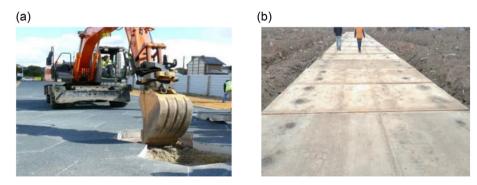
Application of assembly pavement slab with non-force transmission type. (a) Hexagonal slab. (b) Rectangular slab.
